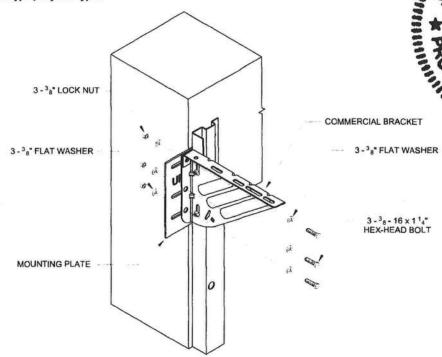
COMMERCIAL BRACKET TO WALL (STEEL JAMB)
